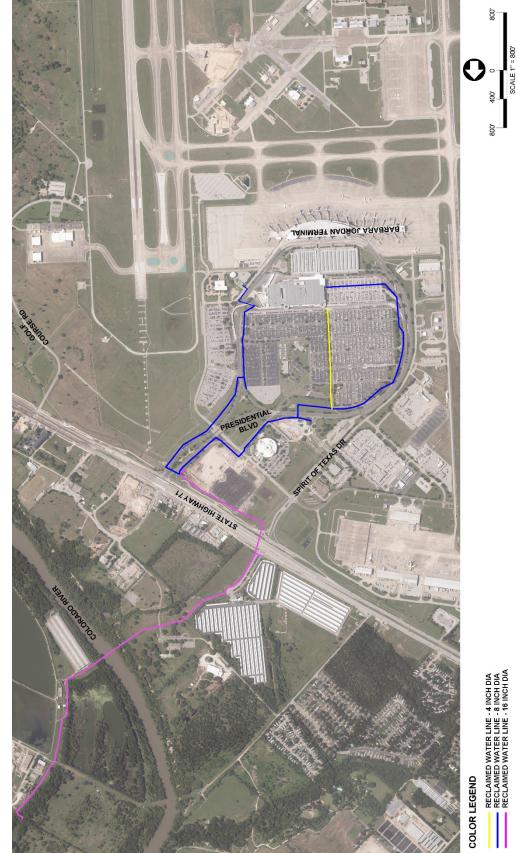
Existing Reclaimed Water Service Layout
